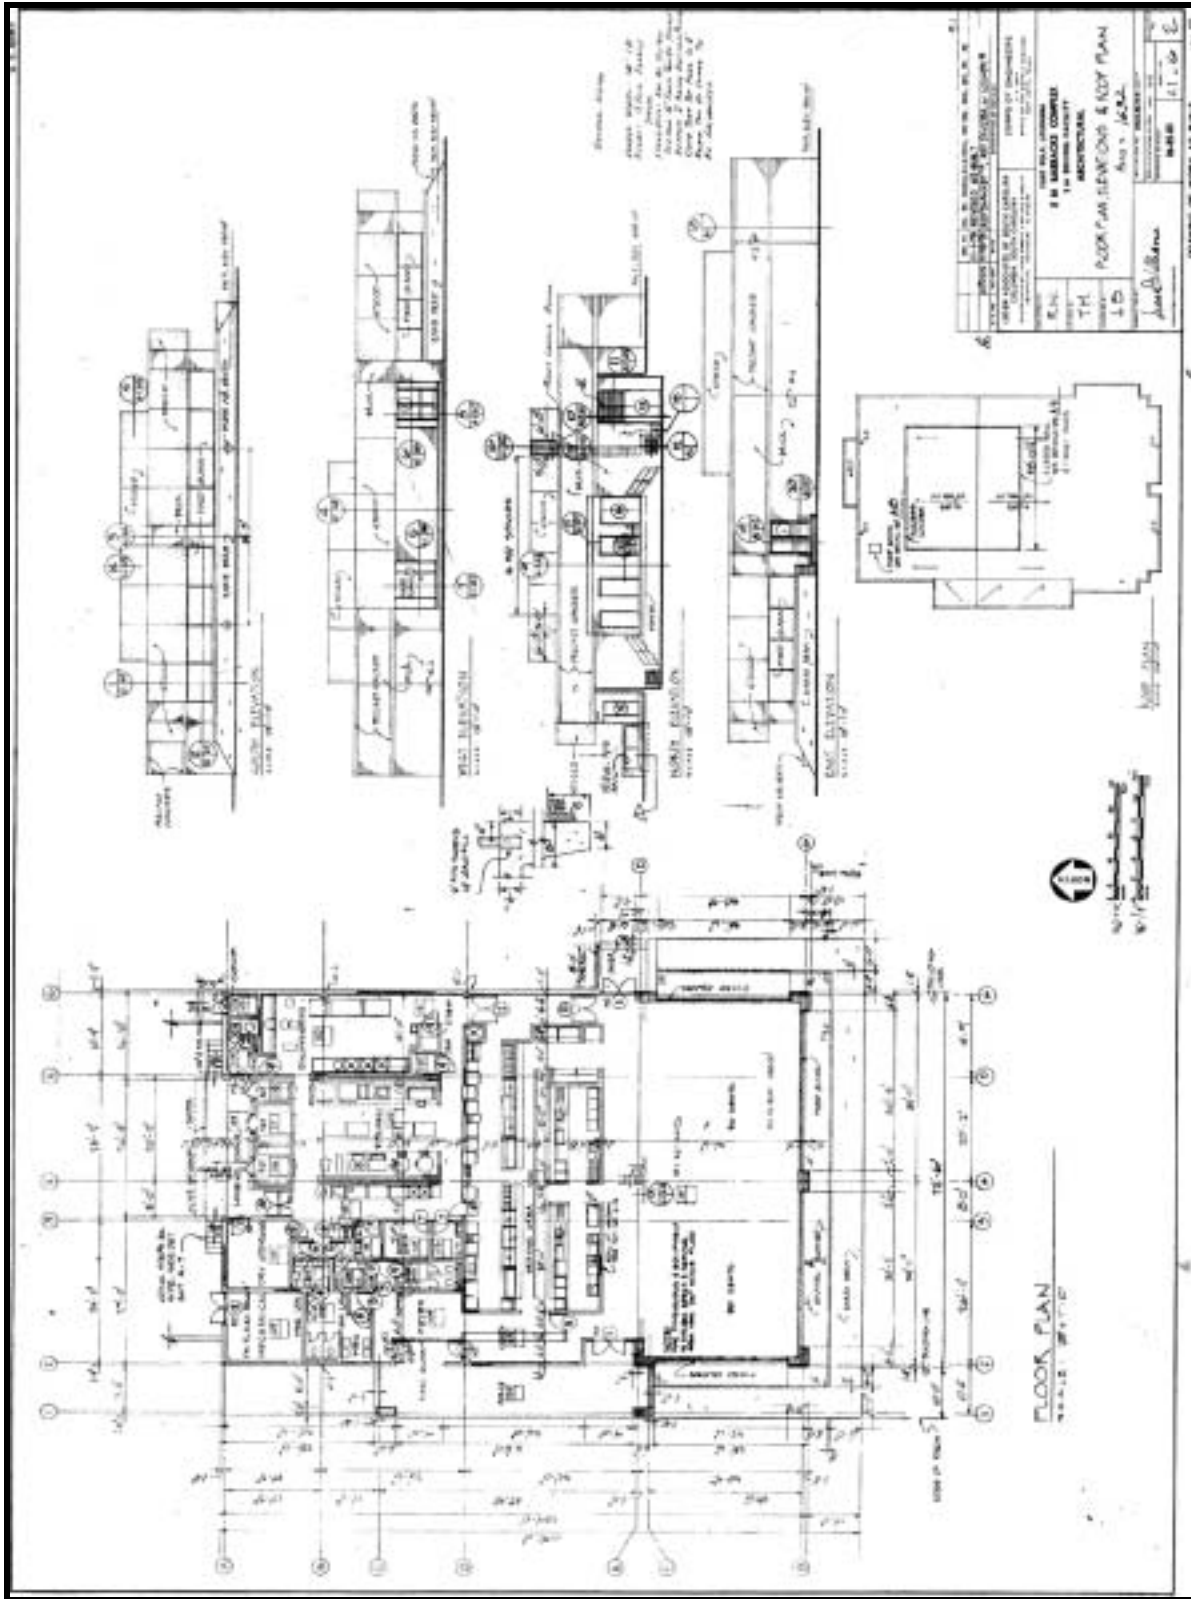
LBC&W dining facility, floor plan and elevations, Ft. Polk (1973, revised 1976) (Engineering, Ft. Polk).
